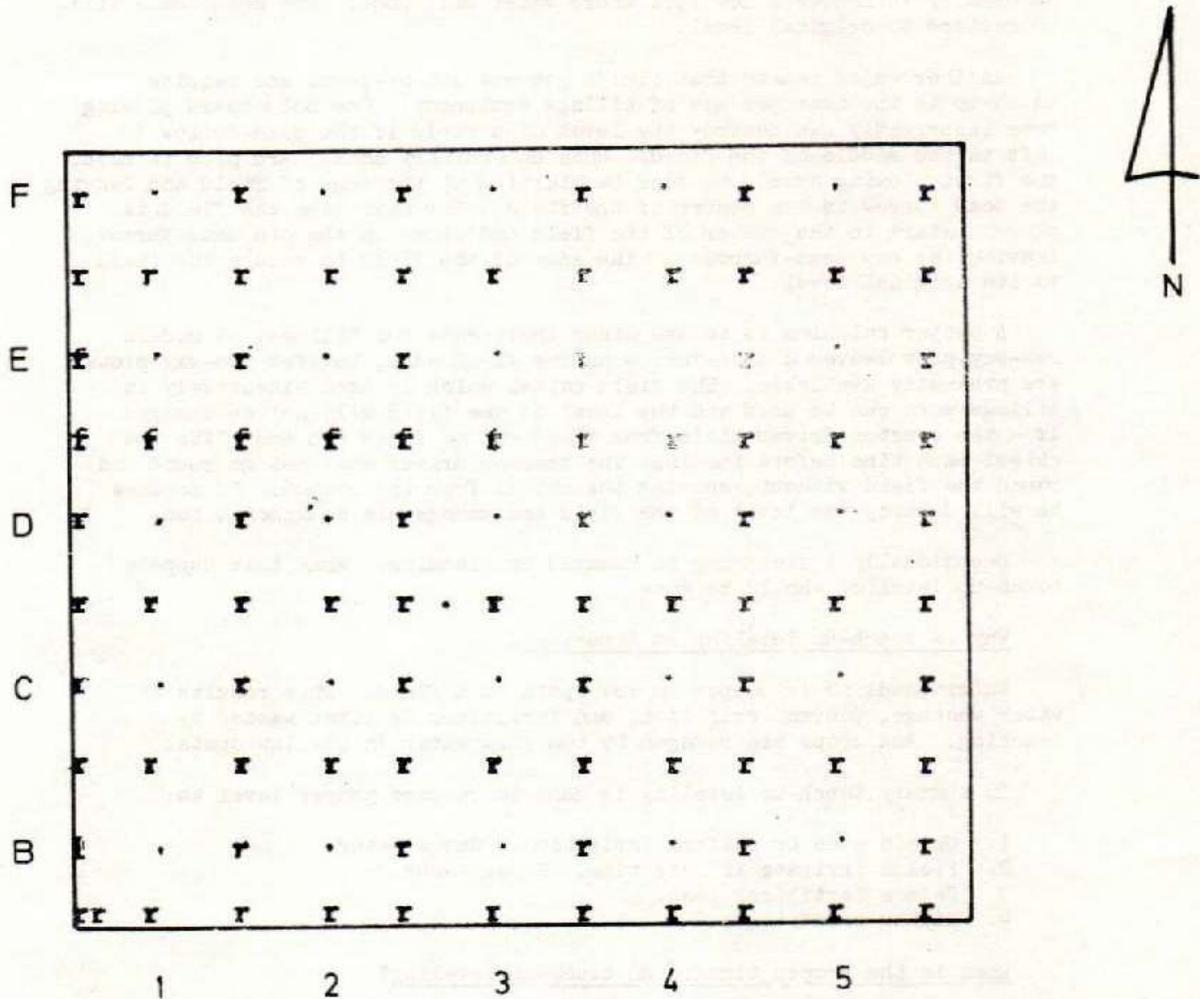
CHECKING CONSTRUCTION JOB USING GRAPH PAPER
